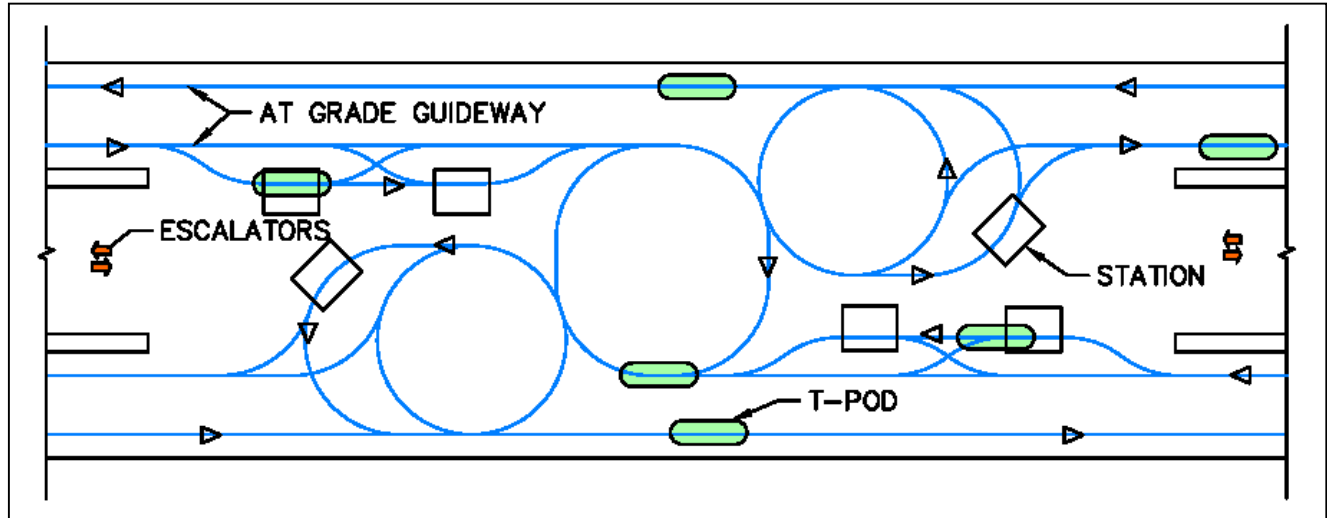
PRT station layout. This layout demonstrates how four guideways and a 6-bay station could be accommodated in two tunnels and one station of the existing APM at Denver International Airport. The somewhat complex layout allows any T-Pod to depart any bay and access any guideway while also providing guideway/tunnel redundancy by having bi-directional flow in each tunnel. Uni-directional flow results in a much simpler layout at the expense of redundancy.
